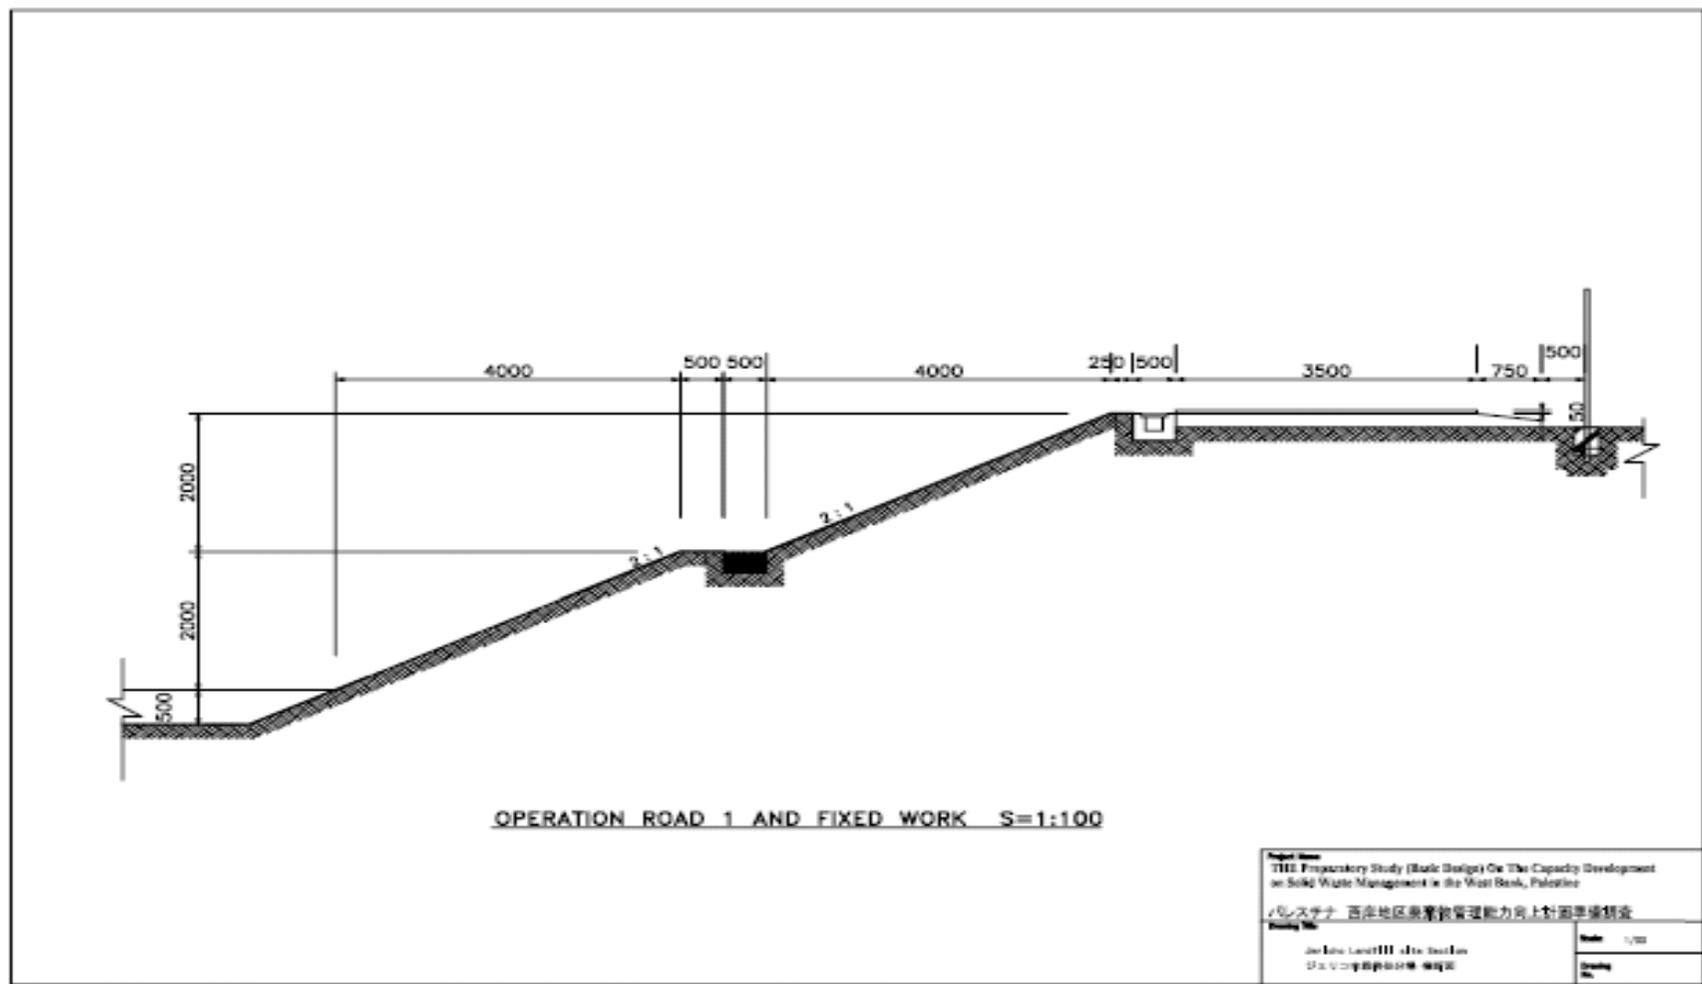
Cross Section of Final Landfill Facilities (Jericho JC)
